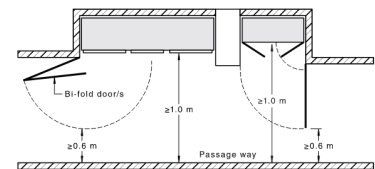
ACCESS TO SWITCHBOARDS—SWITCHBOARD DOORS THAT OPEN INTO ACCESS WAYS OR NARROW PASSAGE WAYS
